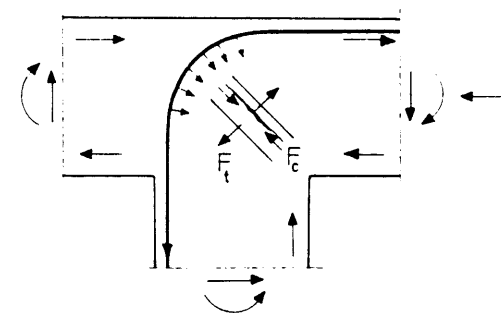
Forces in T-Joint According to Truss Mechanism
